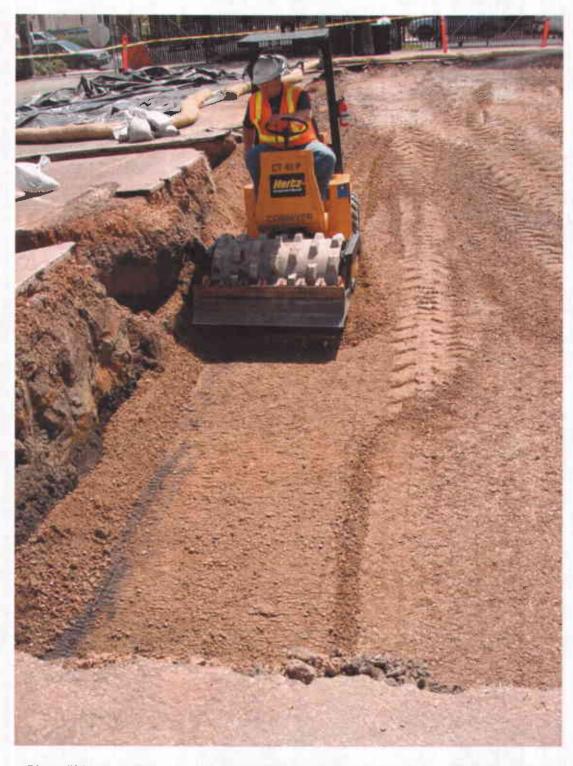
Backfilling operations: Initial use of a one-ton John Deere CP-40 sheep foot compactor for backfill compaction (Facing east; 4/26/2007)
